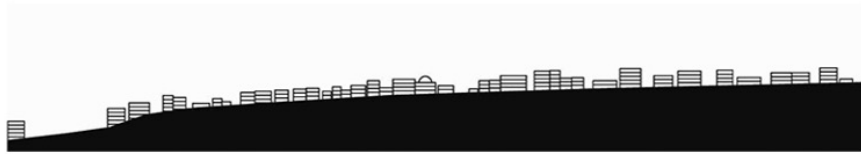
Kadikoy-Fikirtepe Area Cross Section, Section (Author)
